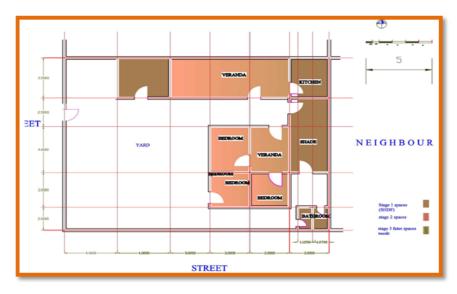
Naiema Ahmed Hasan house Ground floor plan(Source: Author)
